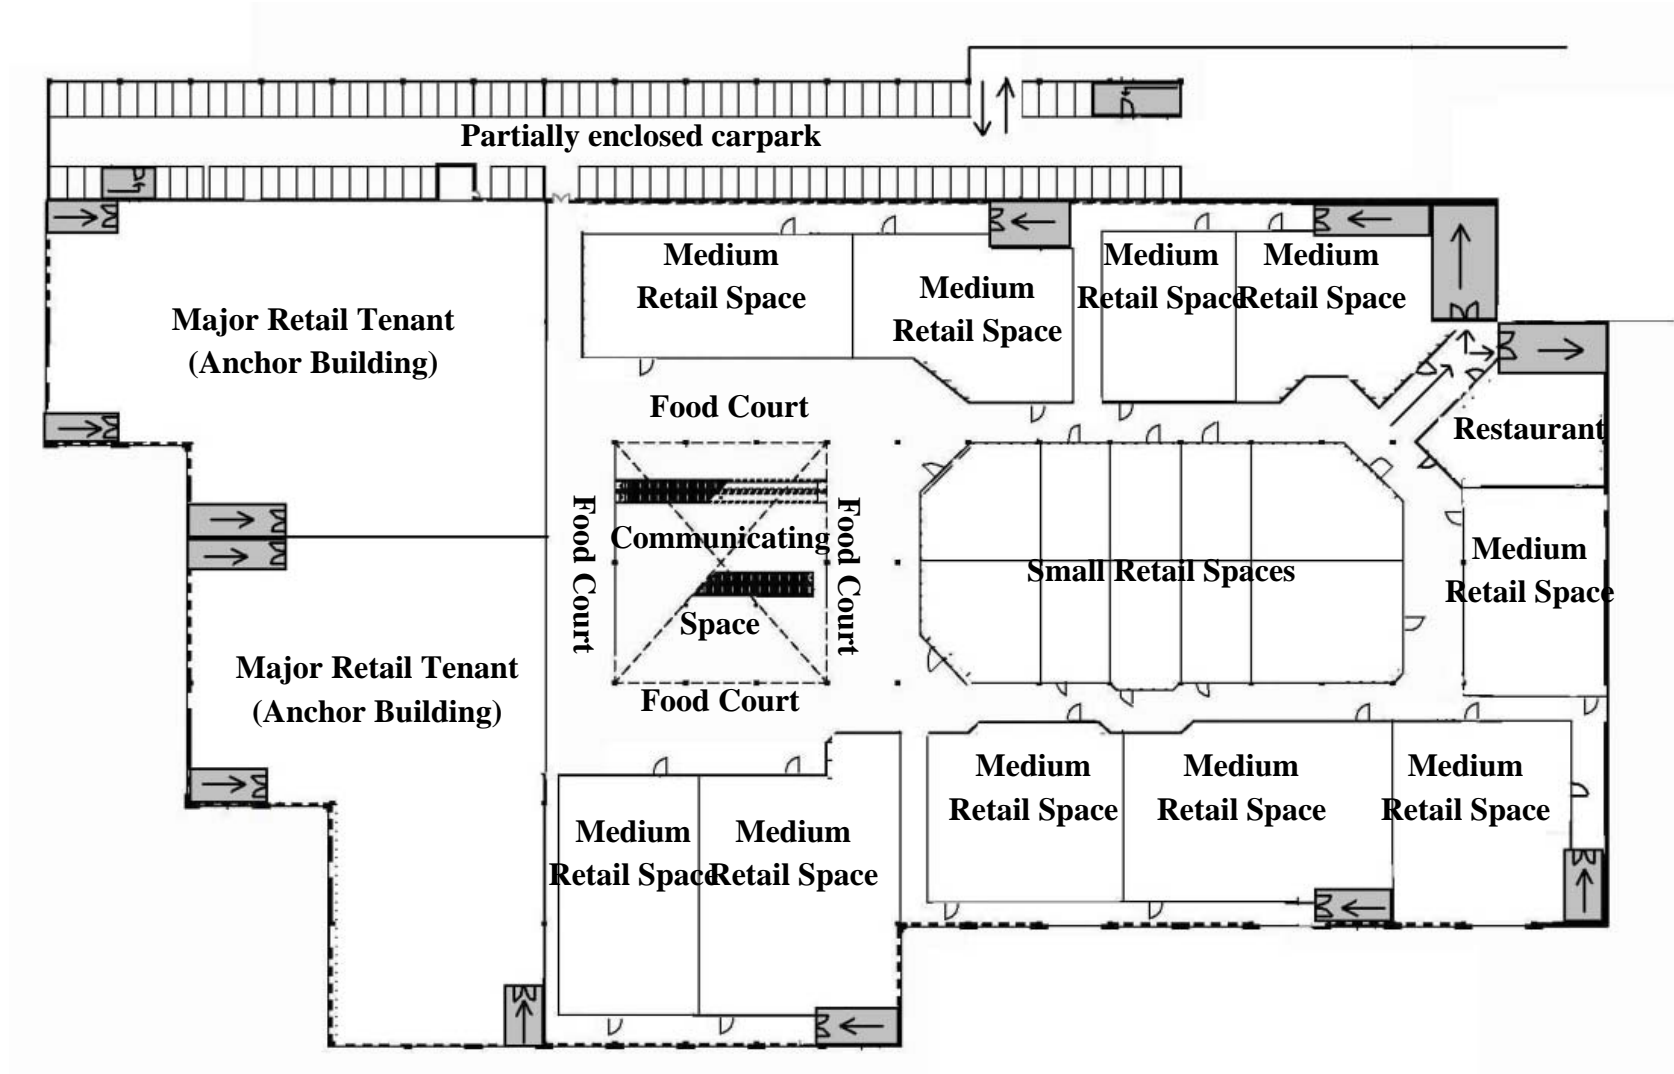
Plan view of floor 3 in shopping mall (not to scale)
